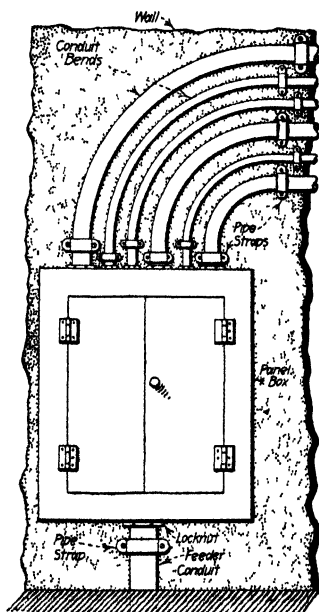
Showing a right-angle turn made in a conduit run with bent conduits.
